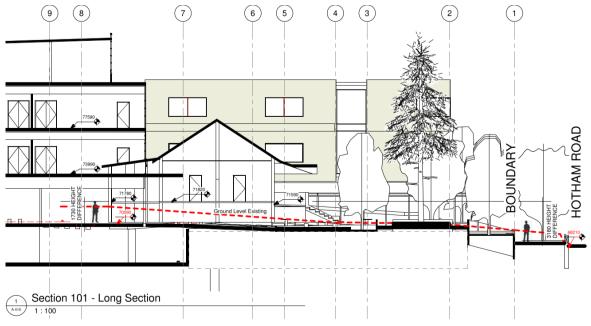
Long section showing height difference of hospital to Hotham House and intrusion of roof onto patient windows.
